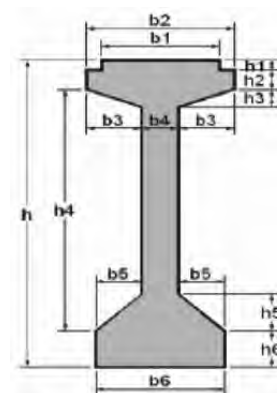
Standard Cross Sections for PC-I Girder
